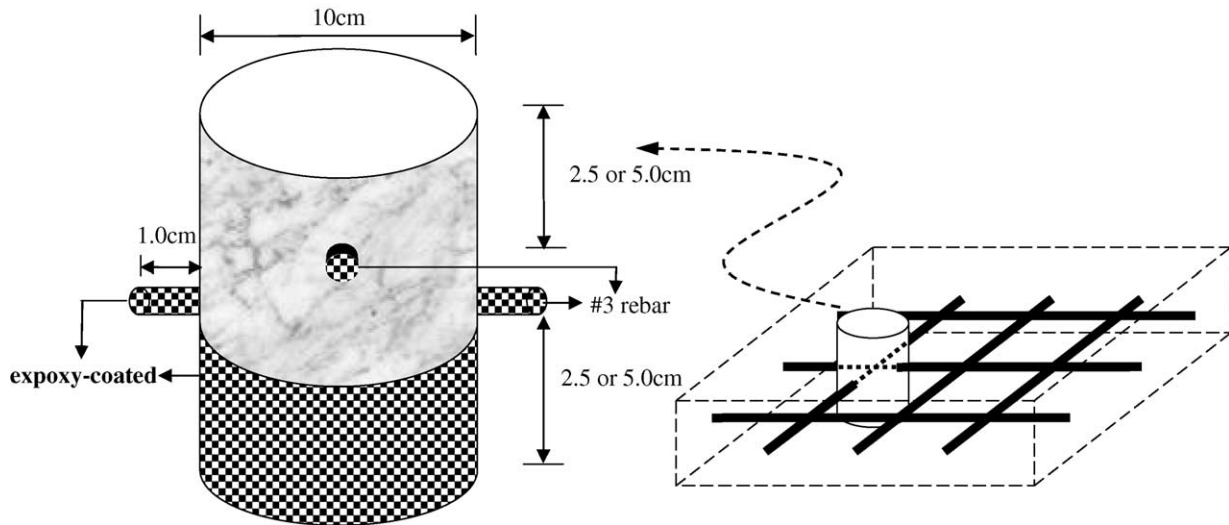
Specimen designation and its purpose of simulating a concrete slab.
